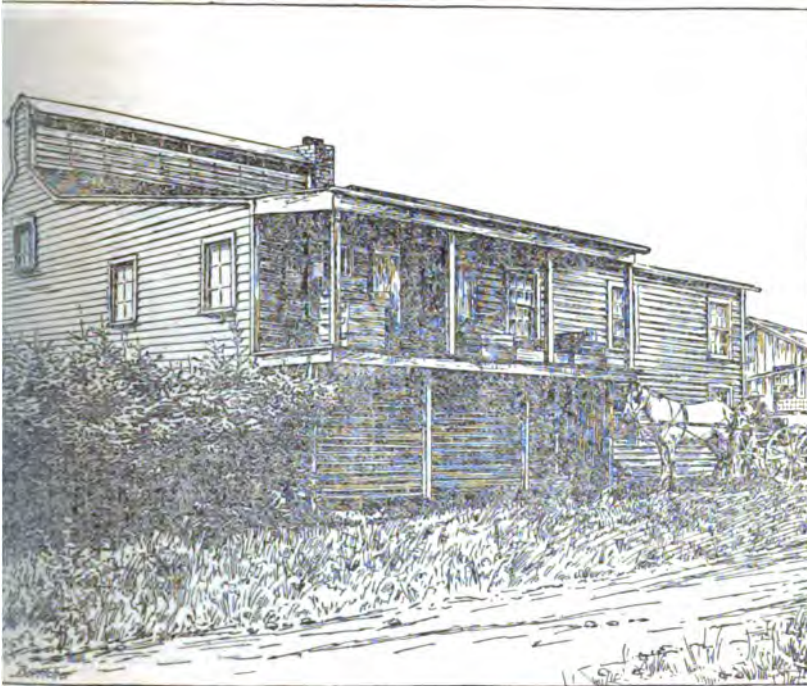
Elevation of building, plans of which are shown in figures 19 and 20.
